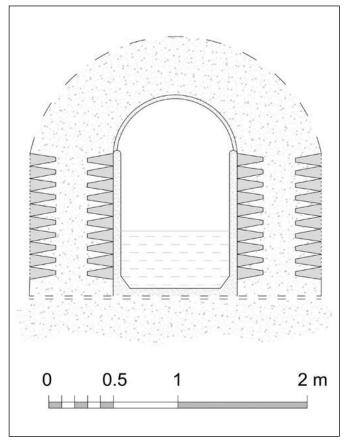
section of the conduit in the underground sectors. Fig. 11: sezione del condotto nei tratti interrati.
